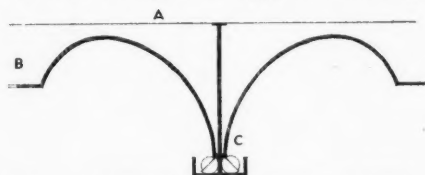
Bar Brazilian, Paris. Section of Ceiling.
